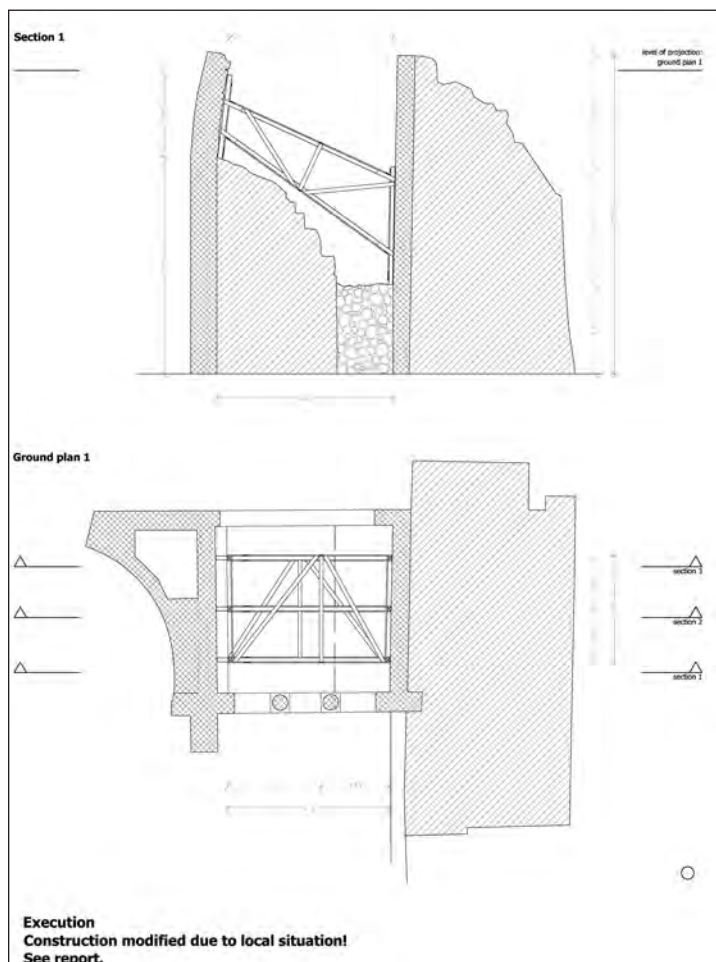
Resafa, Basilica A, temporary supportive construction in the south side aisle, building plans, Isabelle Frase 2008.
